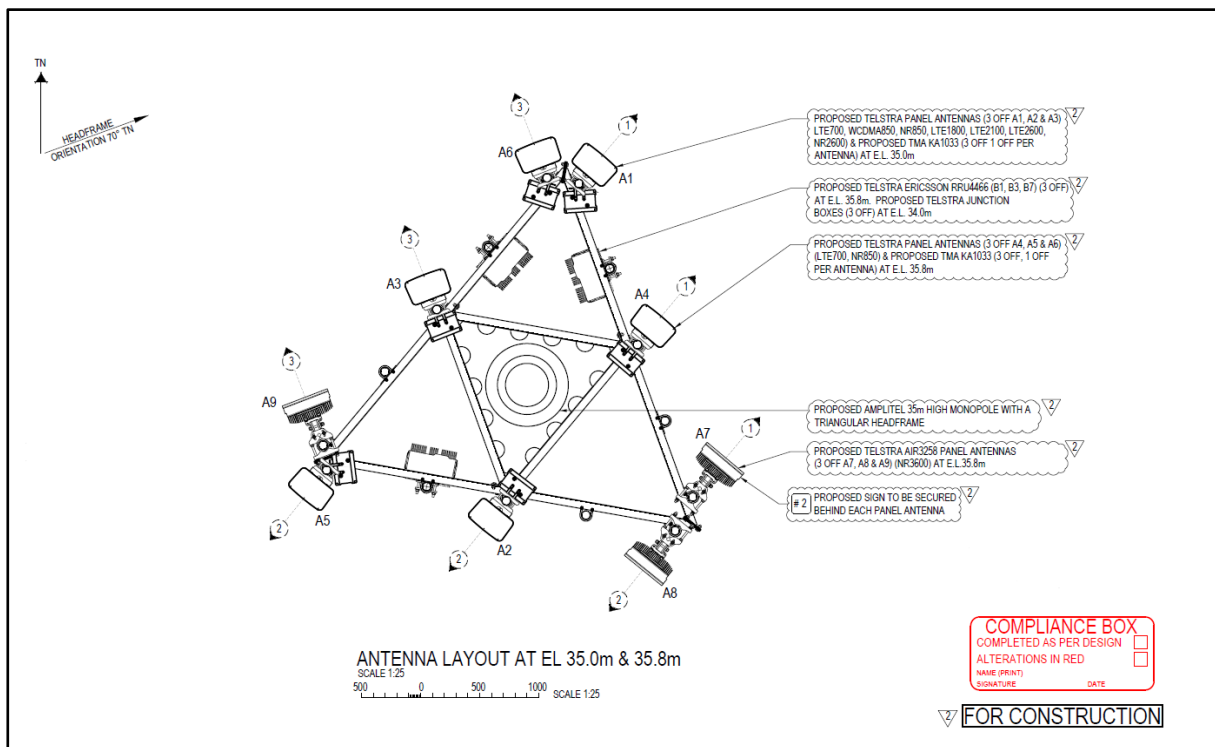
Replacement Telecommunications Facility – Antenna layout Plan
